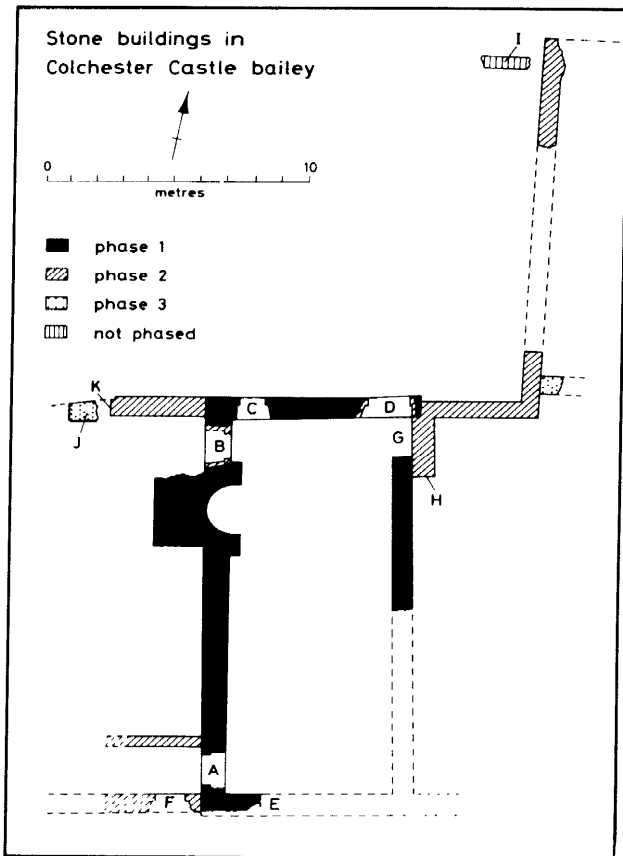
Stone buildings in the castle bailey (after M R Hull & J Drury, courtesy of J Drury)
